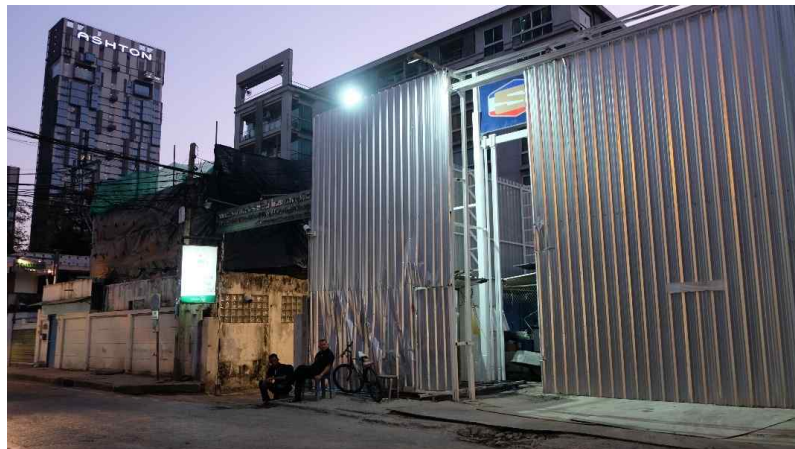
A newly built modern construction, an old-style building, and a construction site on Sukhumvit Soi 38 (© Hane Kang 2018)
